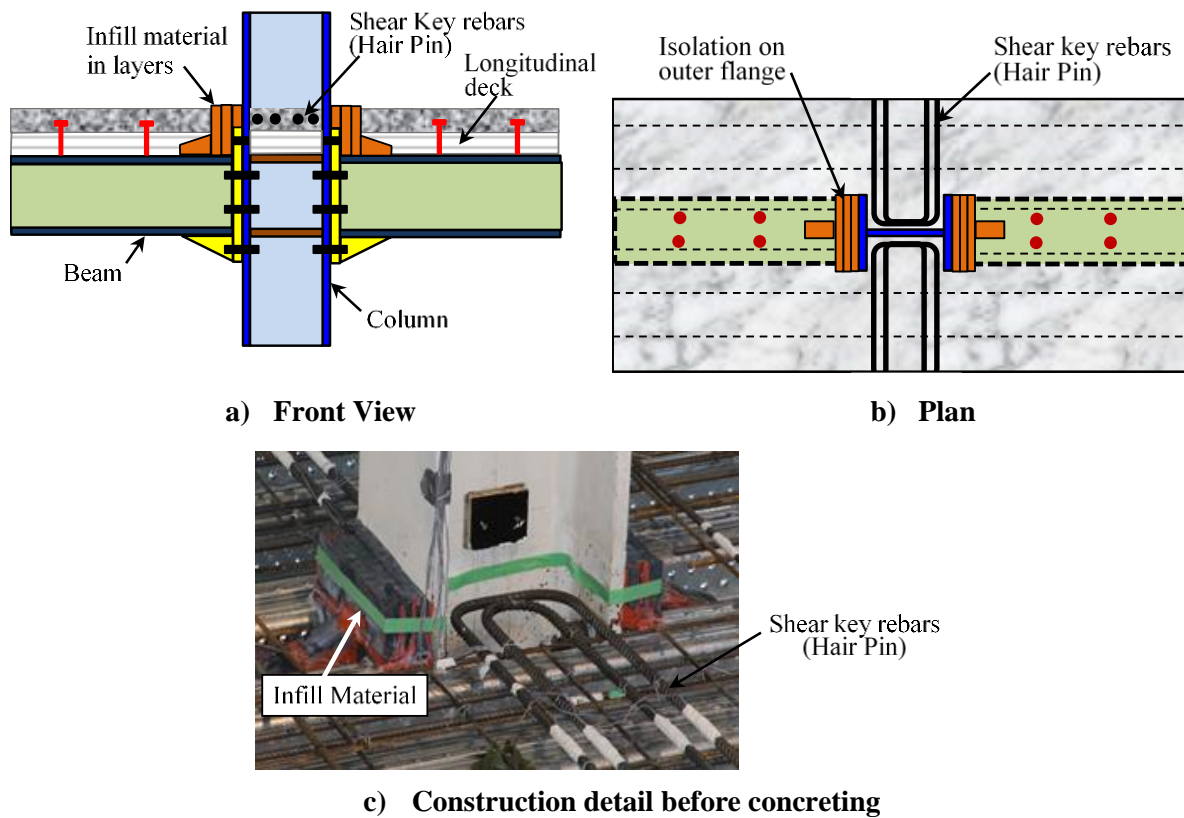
Shear Key Slab Unit (SK-SU) Test Sub-assembly
